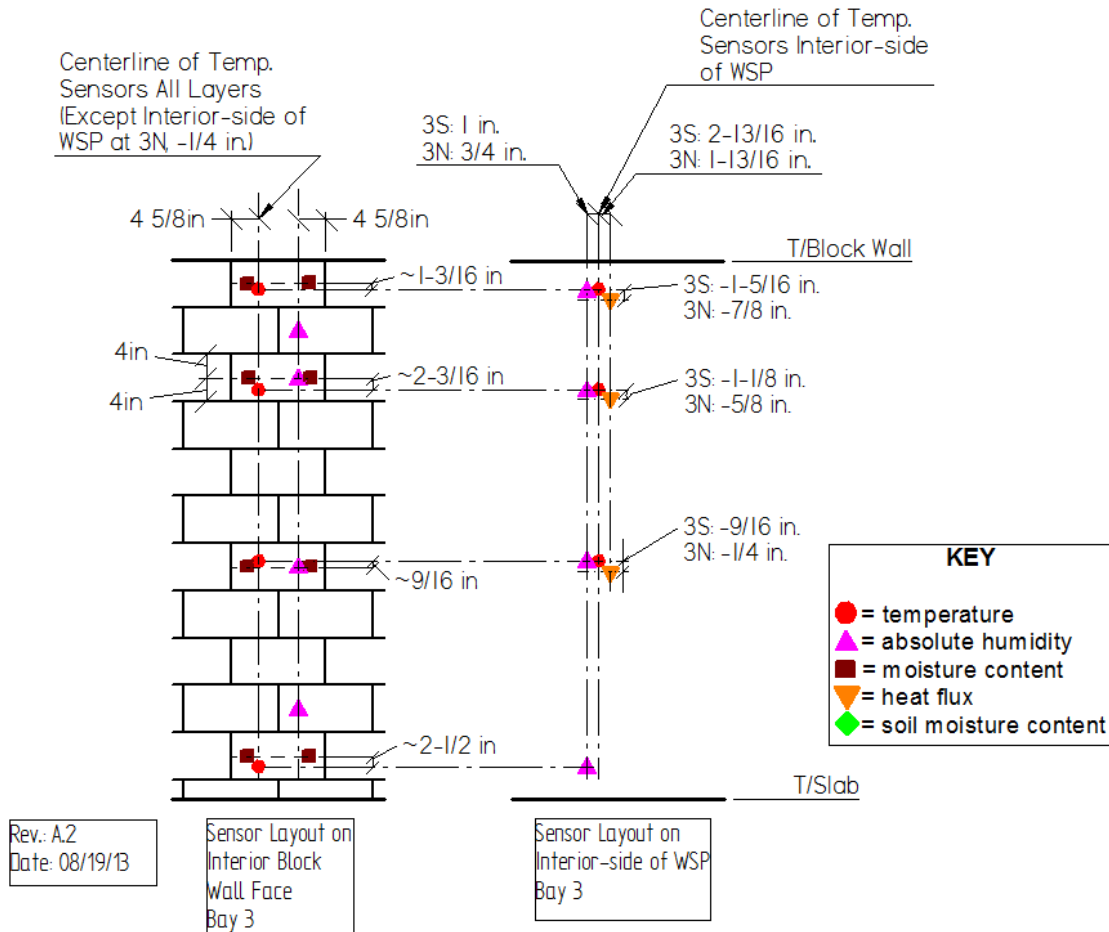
Bay 3 Wall System and Instrumentation Layout
